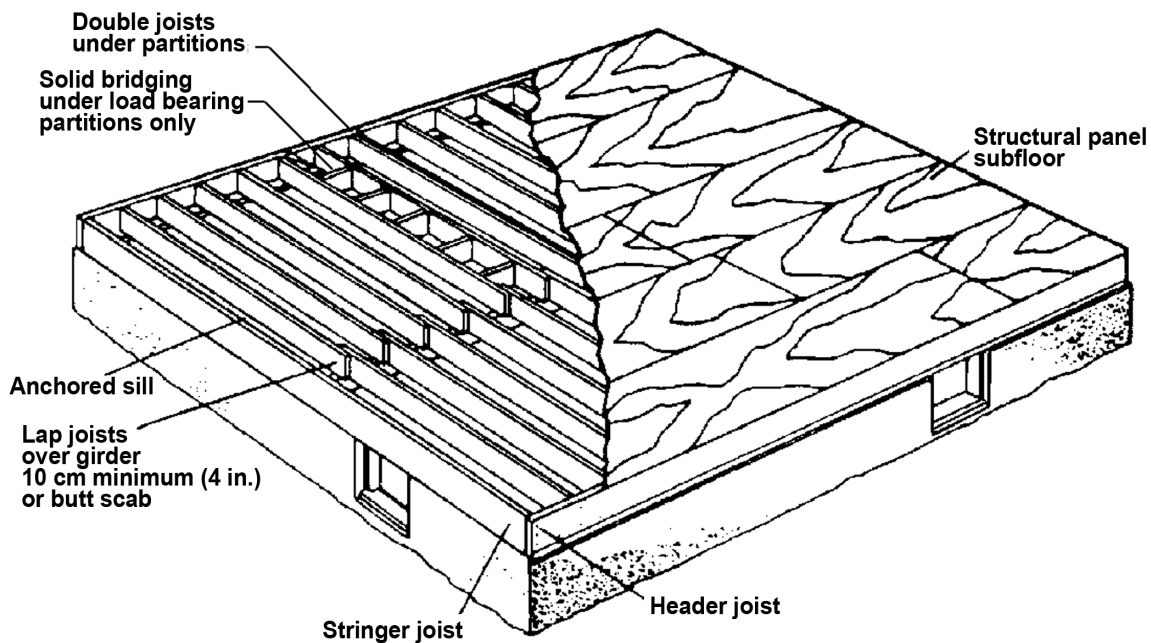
Typical floor details for platform construction with joists spliced on center beam.
